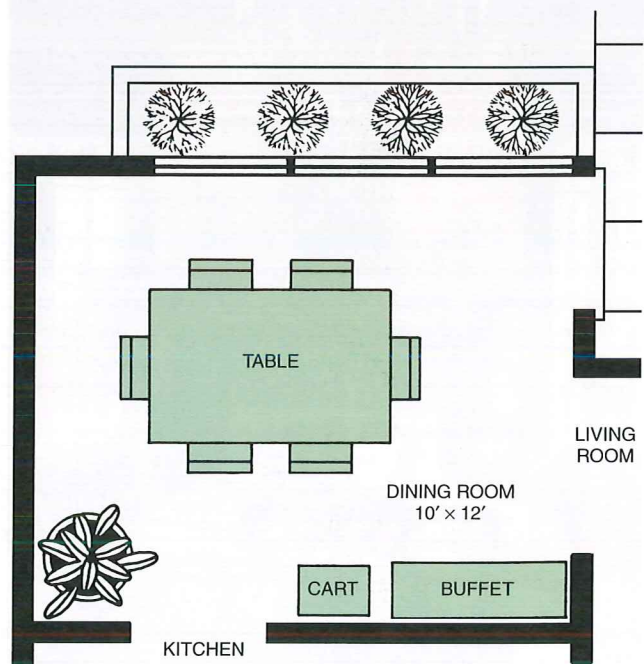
A floor plan of a small dining room that seats four to six people.
